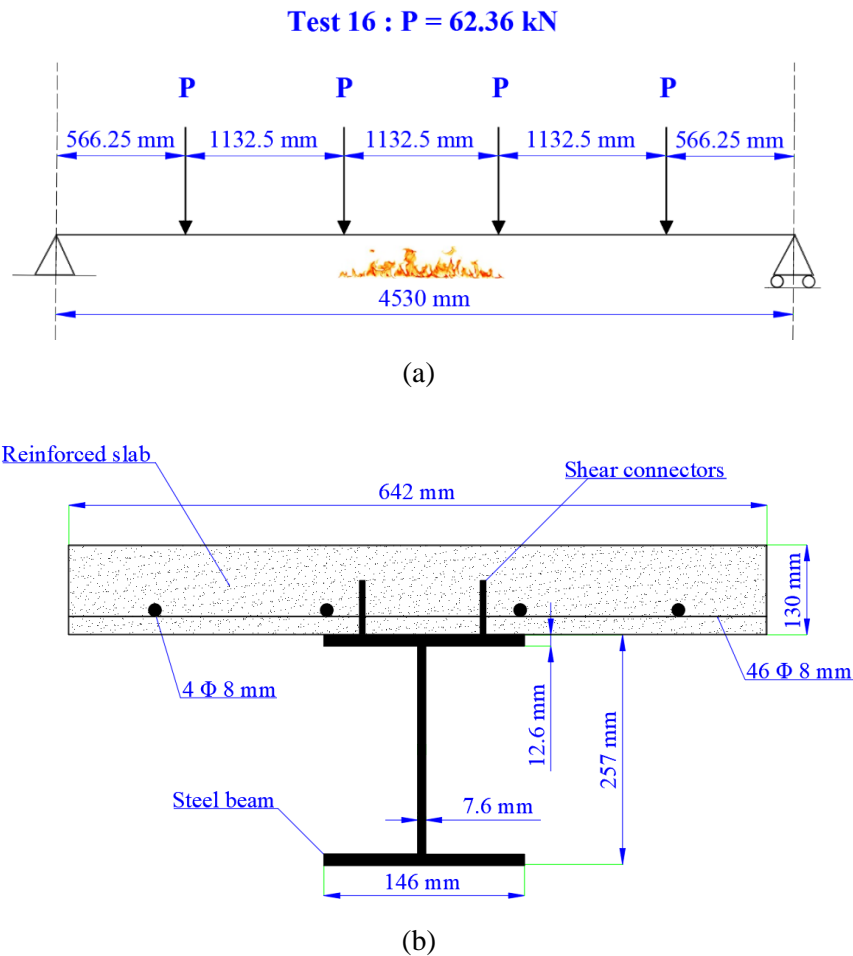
Schematic view of tested beam. (a) beam setup; (b) beam section
